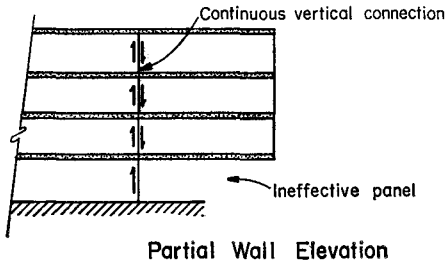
Cantilever mode—Two adjacent wall panel stacks.
